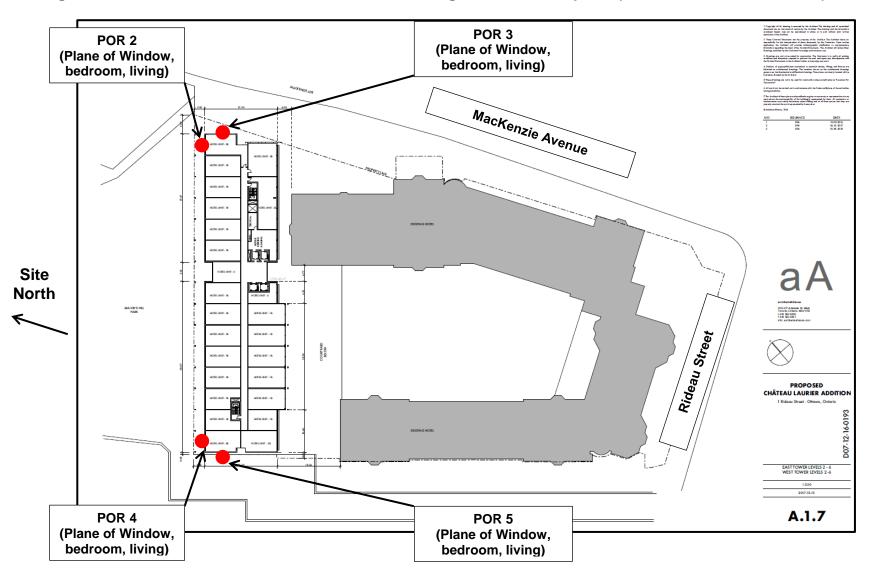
Seventh to Eight Floor Level Plan (source: architectsAlliance)
